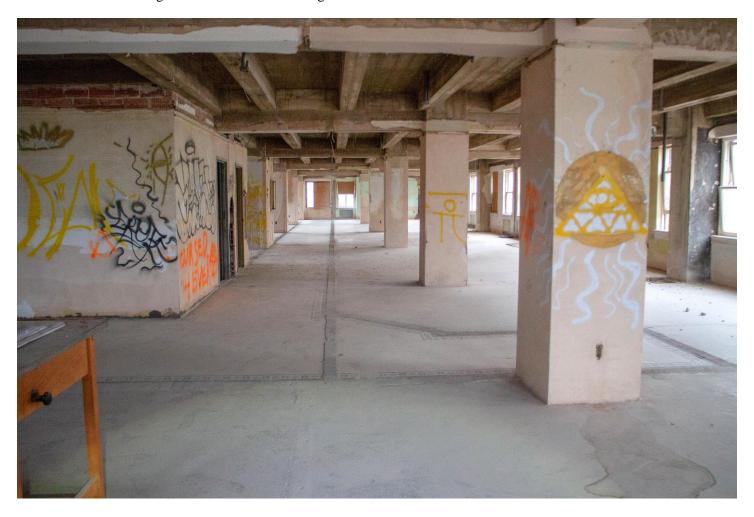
Second floor detail of mosaic tile floor and terrazzo. Camera facing west.
